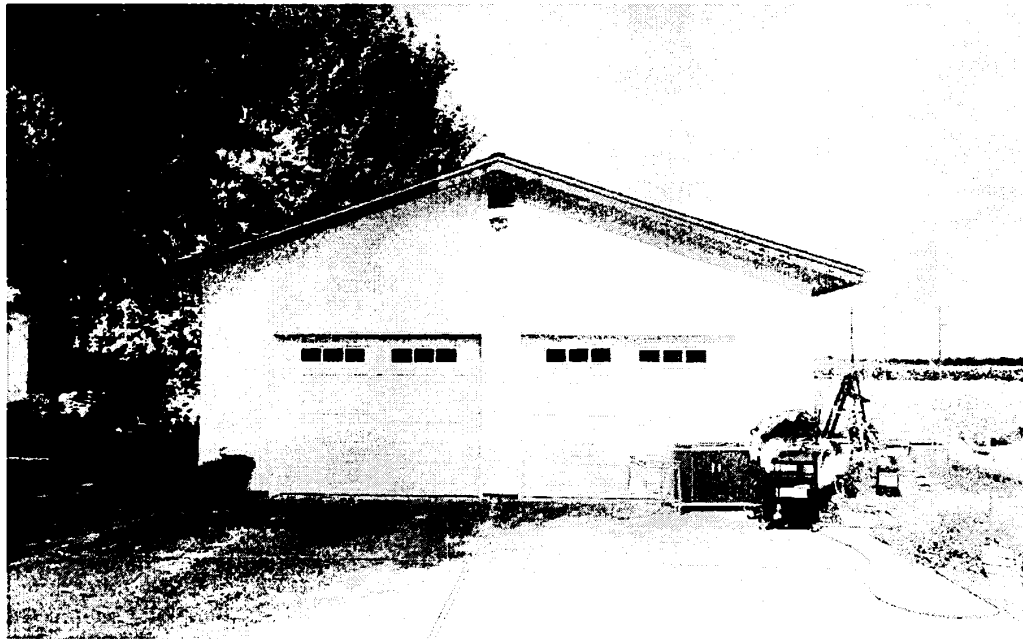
North elevation of the garage. Camera facing south, September 9, 2025.
